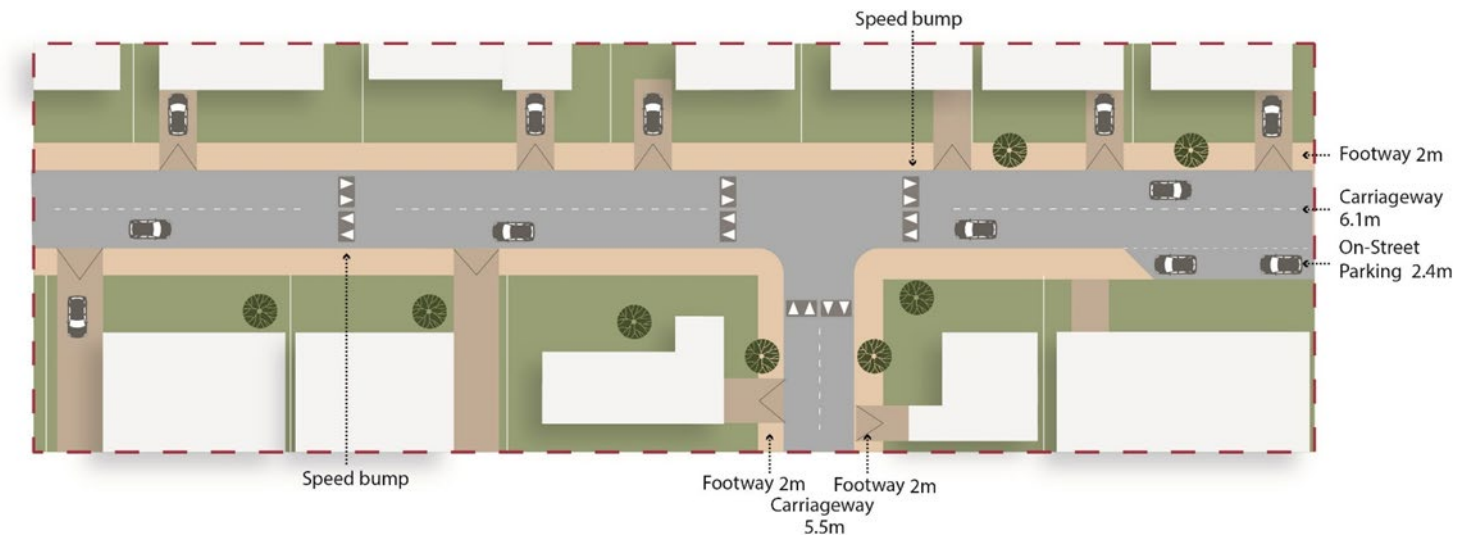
Street Typology Plan for a Poorly Designed Residential Connector Street in an Urban Context
